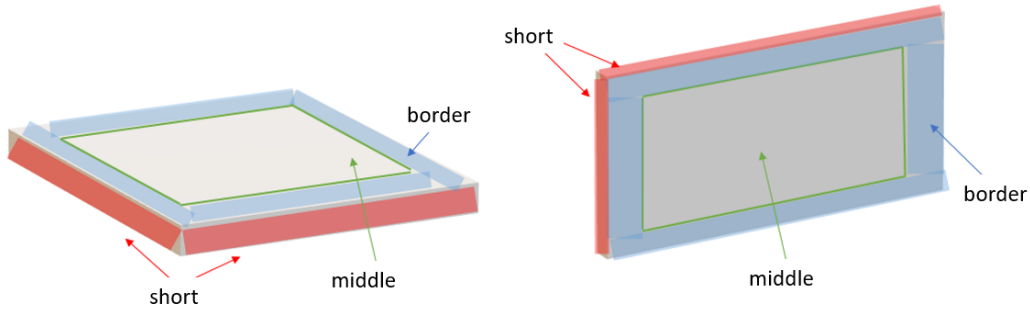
Connection zones in a slab (left) and a wall (right): short, middle and border
